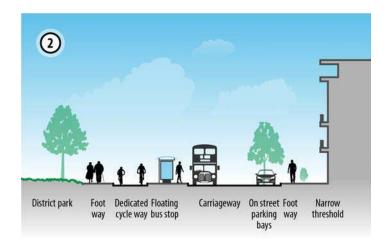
Indicative Street Section 2: Primary Street overlooking Ashton District Park.
